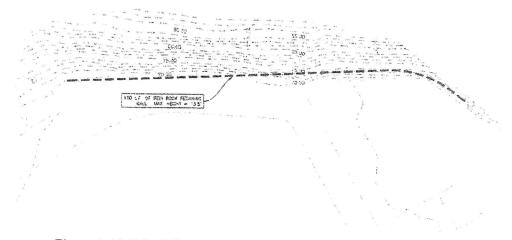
13.5' Redi-Rock retaining wall alignment with minimal setback.
